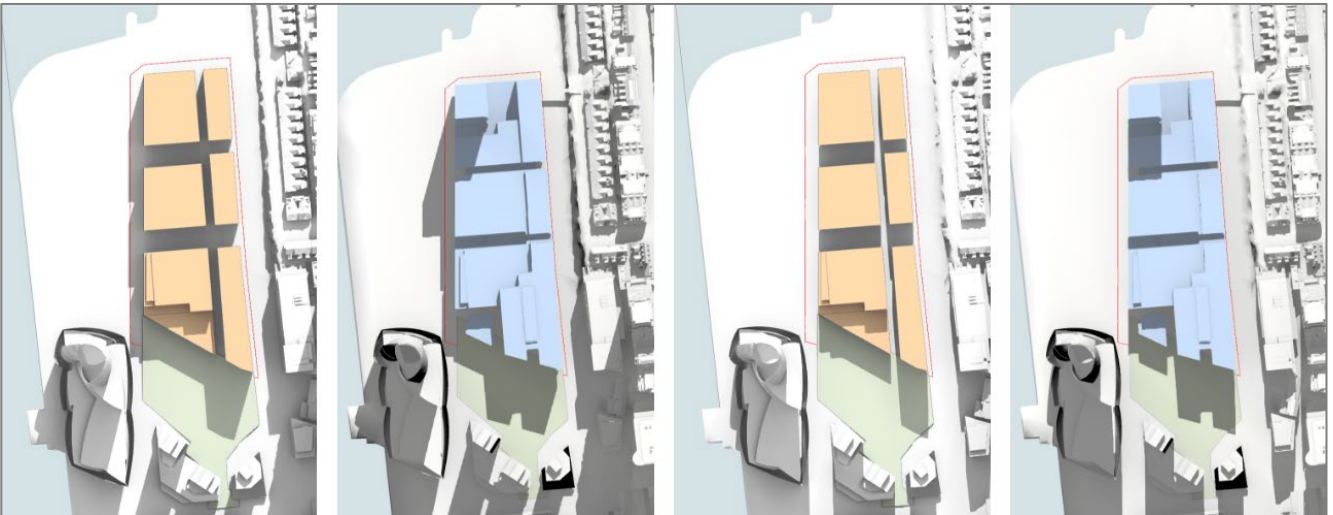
PROPOSED CONCEPT PLAN BUILDING ENVELOPE SOLAR ANALYSIS
